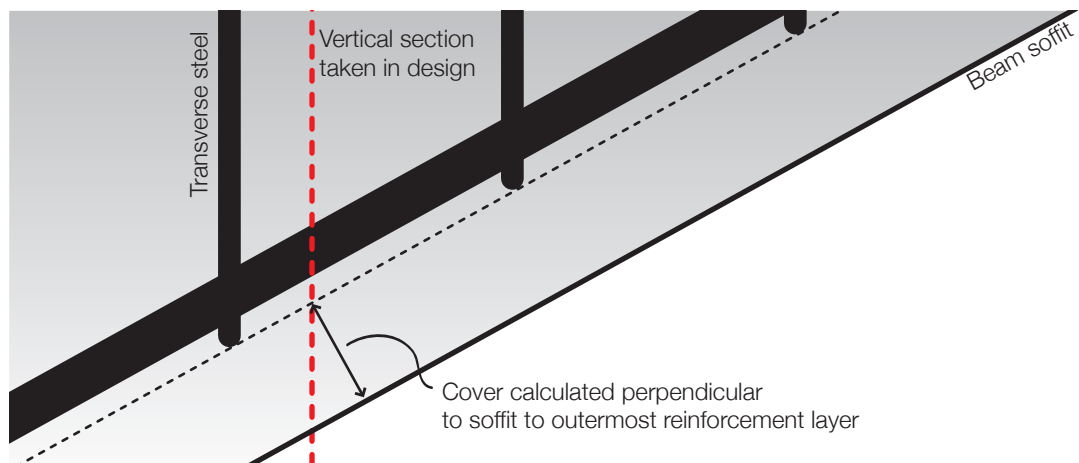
Cover requirements for longitudinal flexural reinforcement.
